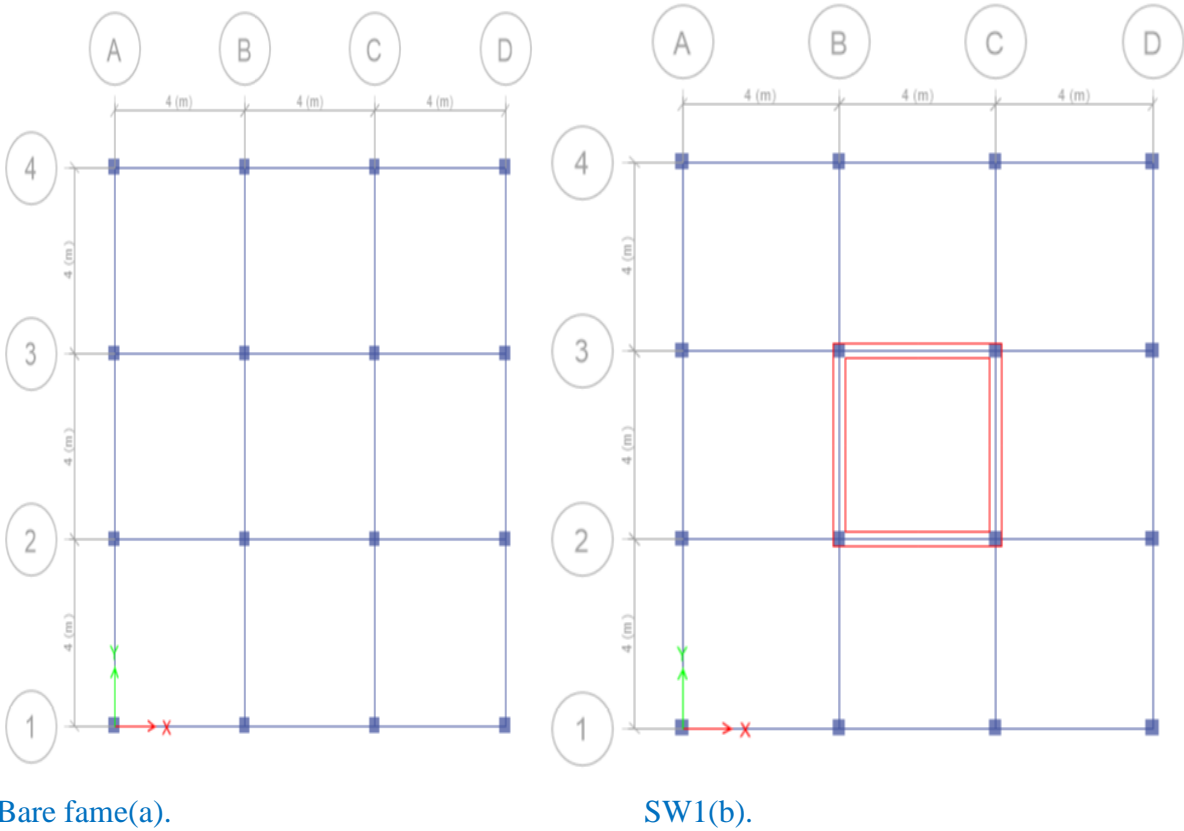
Plan of (a) bare frame and (b) frame with shear wall at the core (Jayalekshmi & Chinmayi, 2014)
